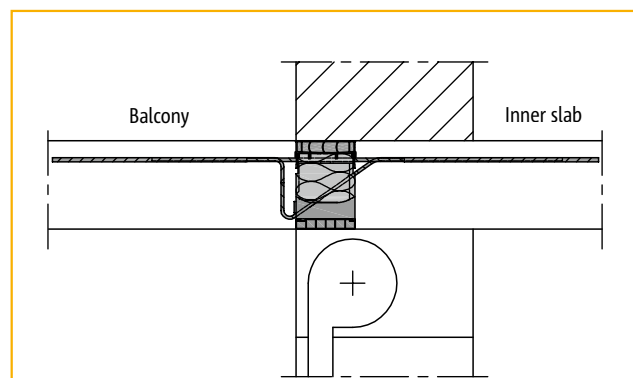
Single-leaf brickwork with blind box and a balcony at inner slab level
